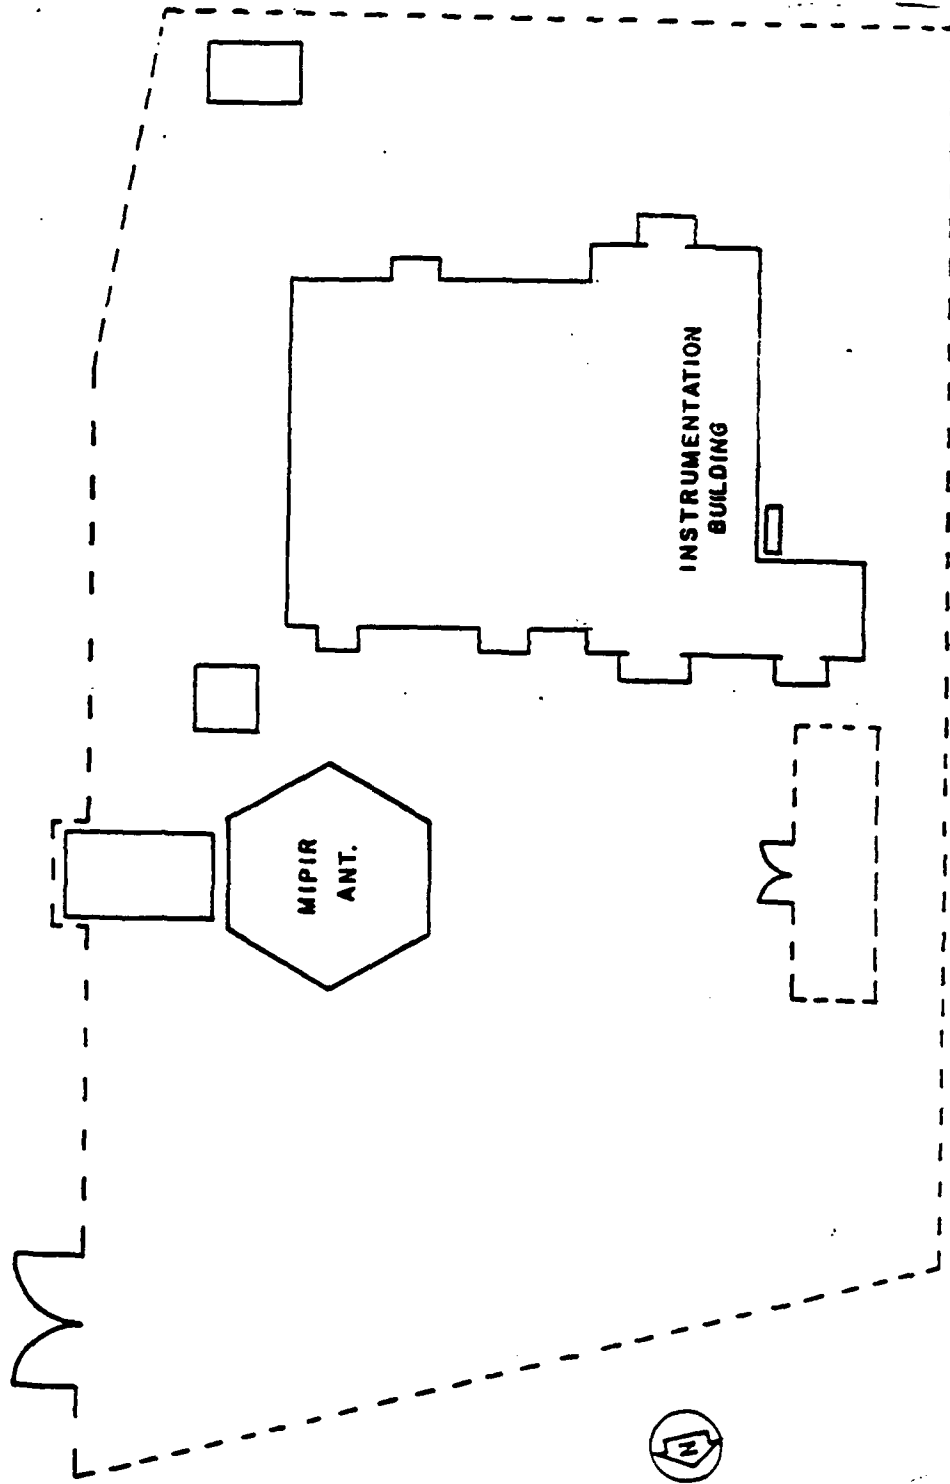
Site Plan, AN/FPQ-14 Kaena Point, Oahu, Hawaii
